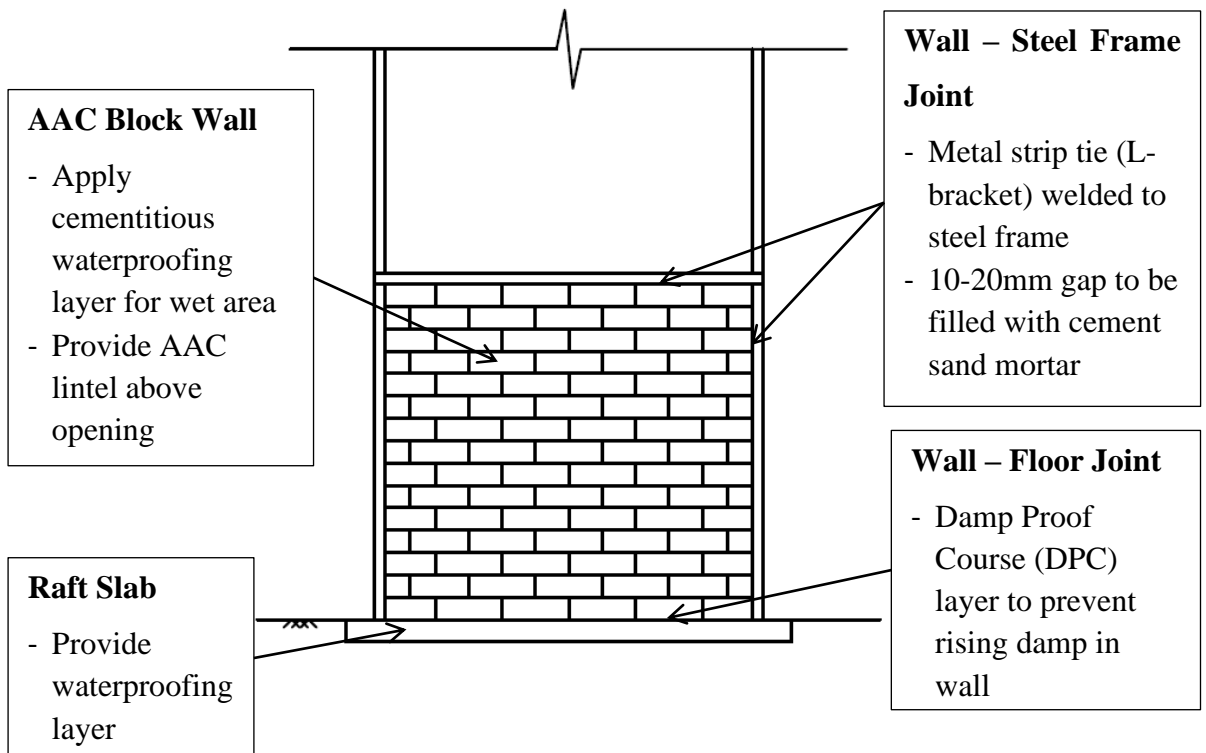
Side View Showing Joints between Dissimilar Materials
